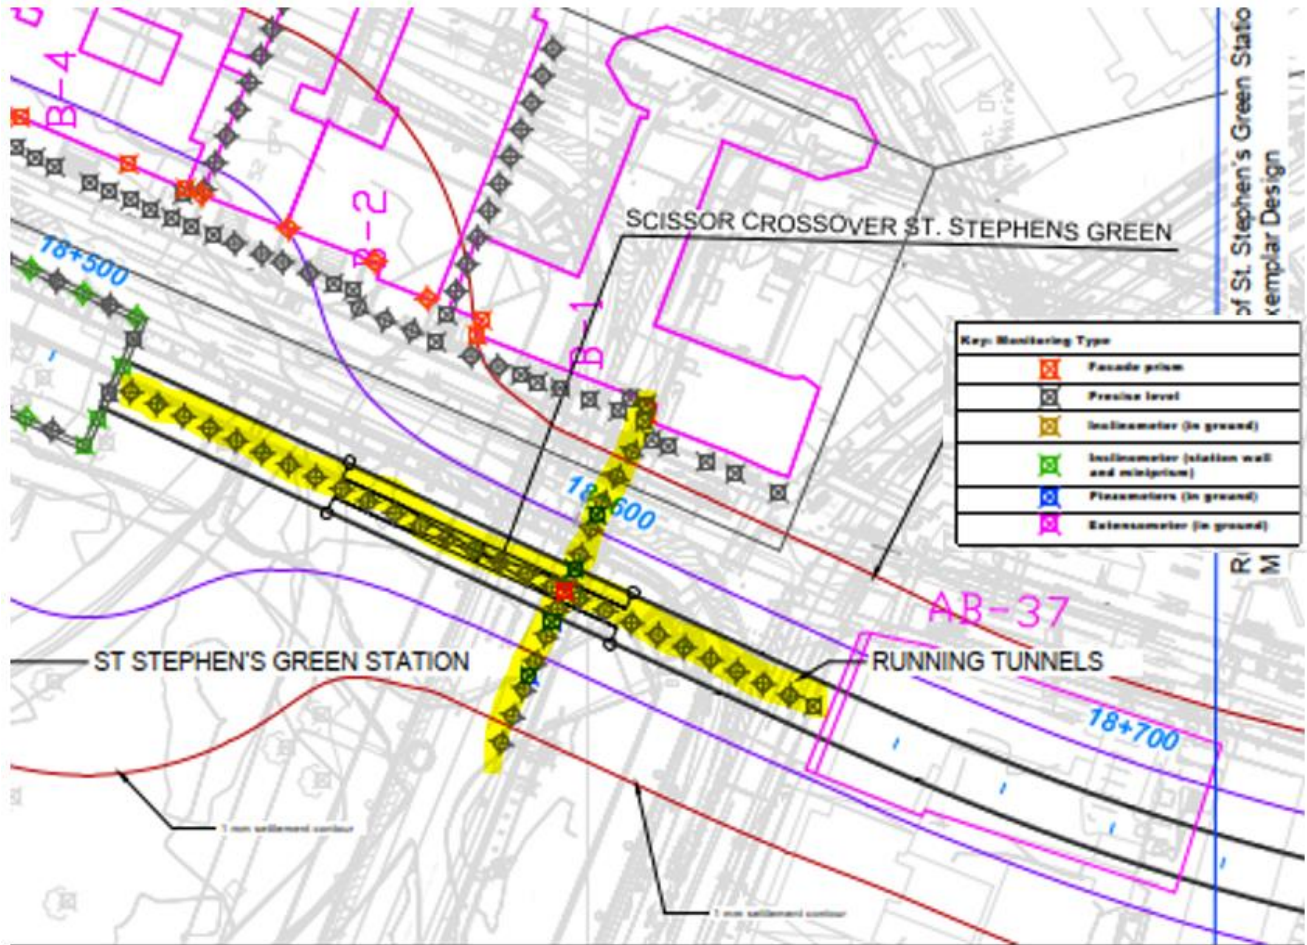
St Stephen's Green Tunnel Construction Monitoring – Precise Levelling Points
